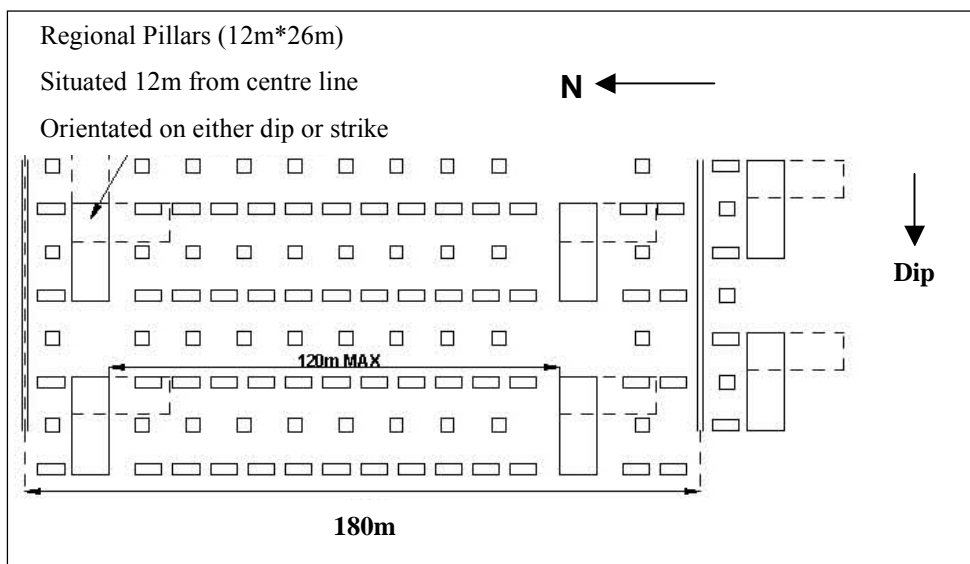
Raiseline and pillar layout at Tau Lekoa Mine
